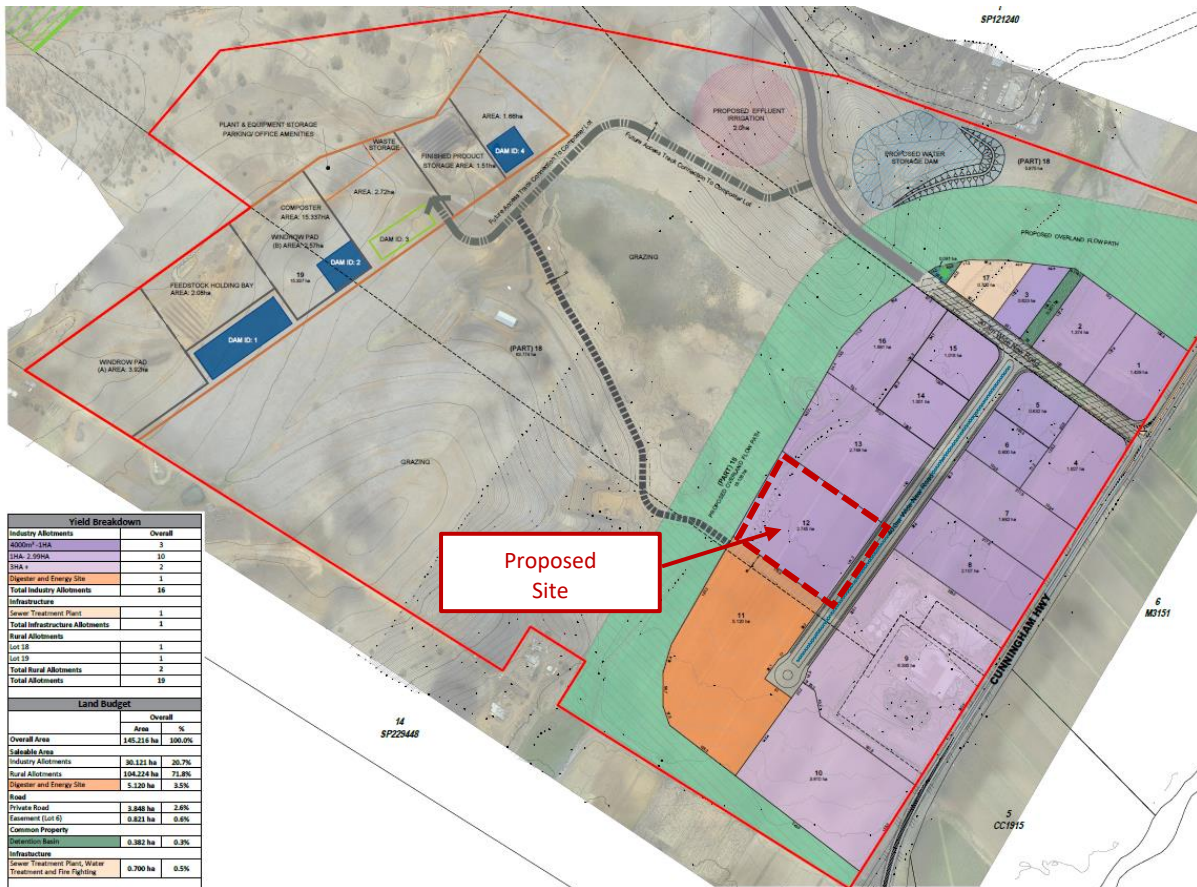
Proposed Warehouse (Lot 12) and overall SRAIP concept plan
